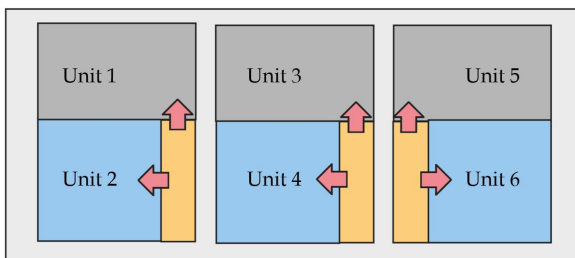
Proposed typical unit layout showing dwelling units (Source: Authors).
